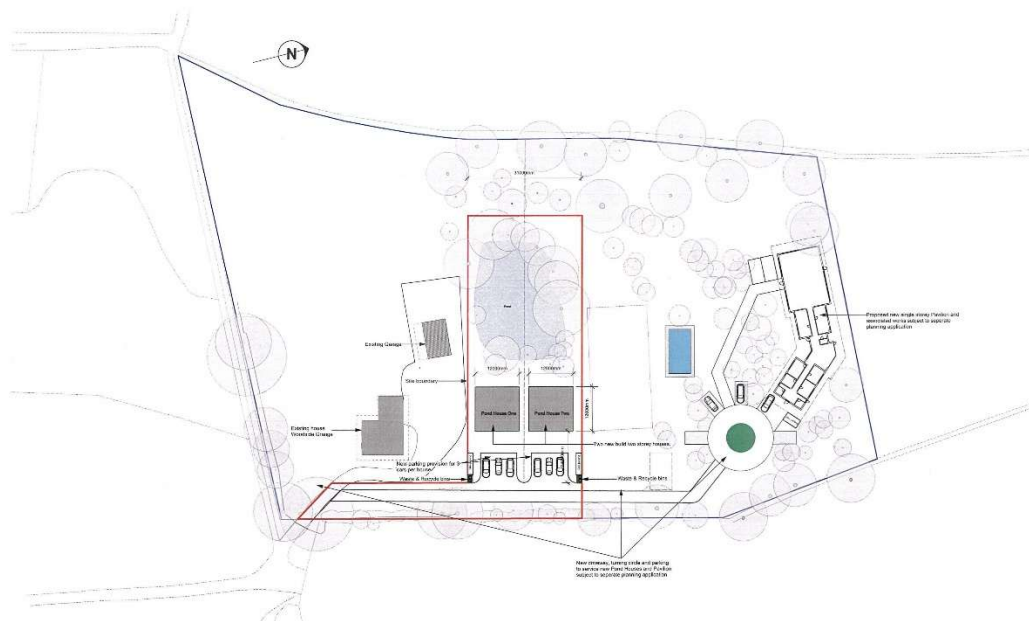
Approved Site Layout (inc. adjacent existing & proposed development)
